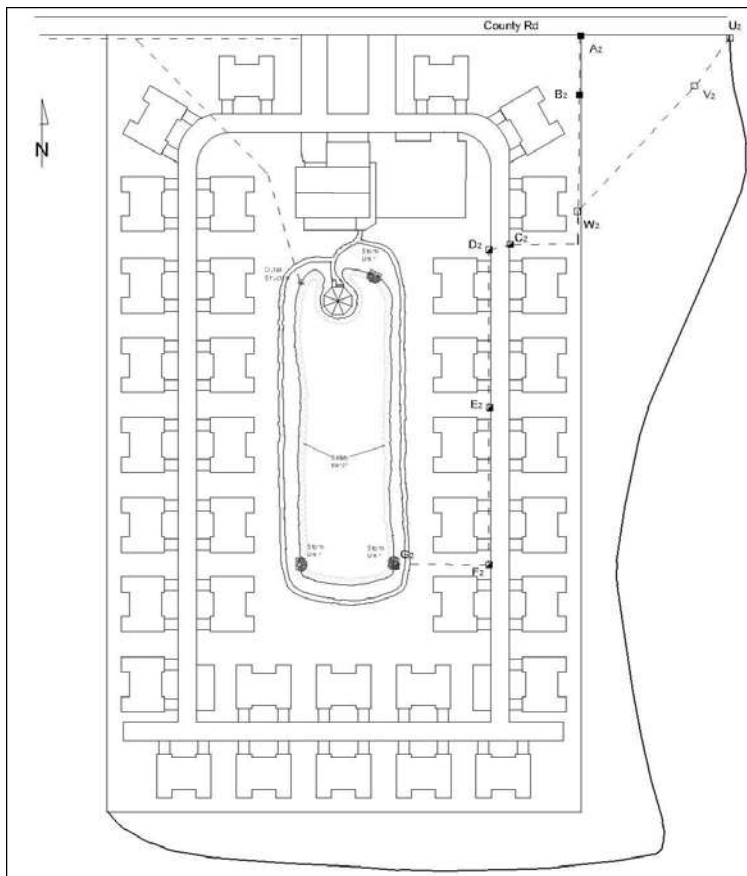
B.3. Post-Development On-site and Off-site Drainage.
